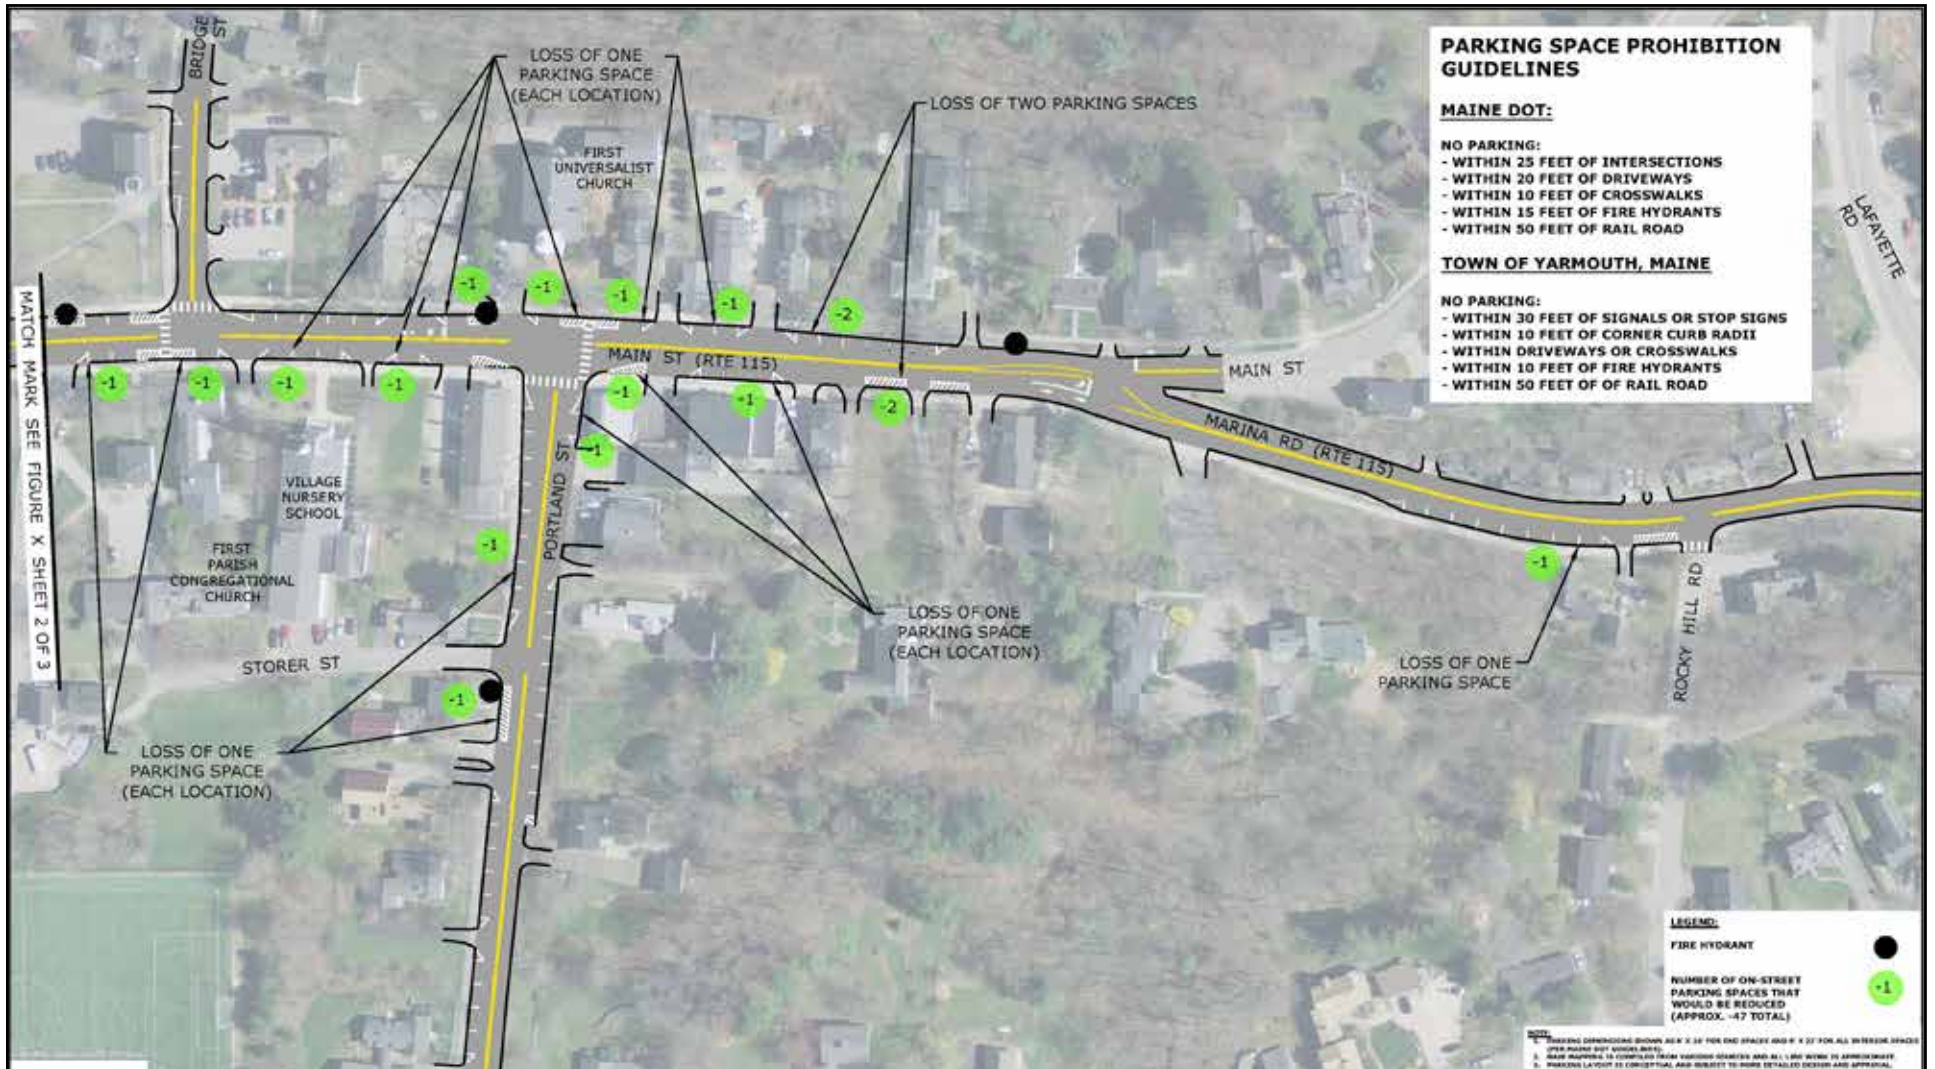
On-Street Parking Space Capacity Evaluation (Downtown / Main Street)
